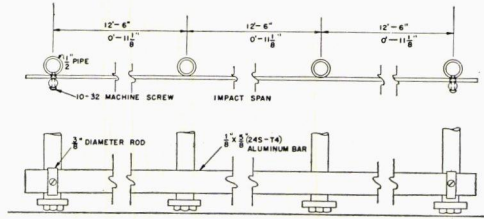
Schematic diagram of beam-type guardrail with rigid posts.
